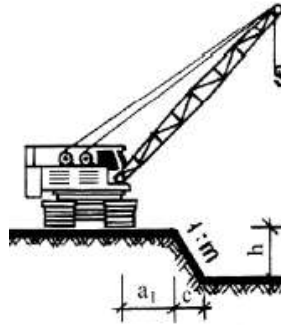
Jib cranes dimensioning to the size of open pits or trenches:
